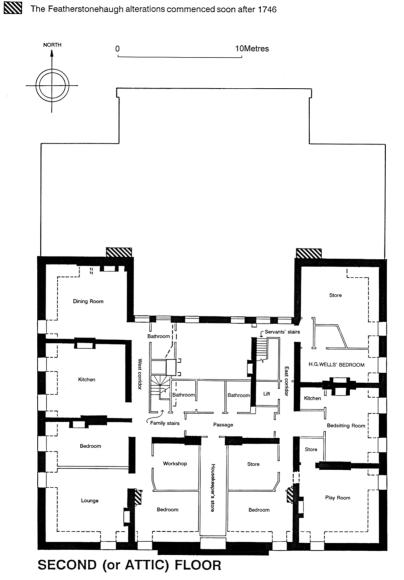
Second or attic-floor plan, showing two of the main periods of construction and the names or uses of rooms current in 1989.
